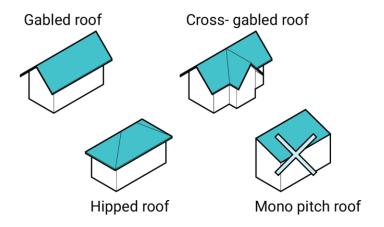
(B)(3)(e)(ii): Roof types — VMU District
